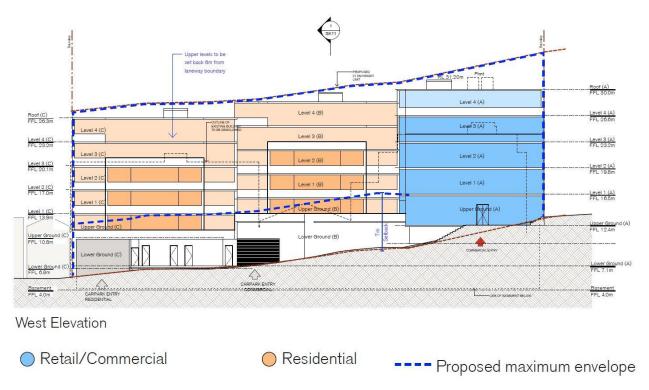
Development concept west elevation facing Brooklyn Lane (source: Tzannes)
